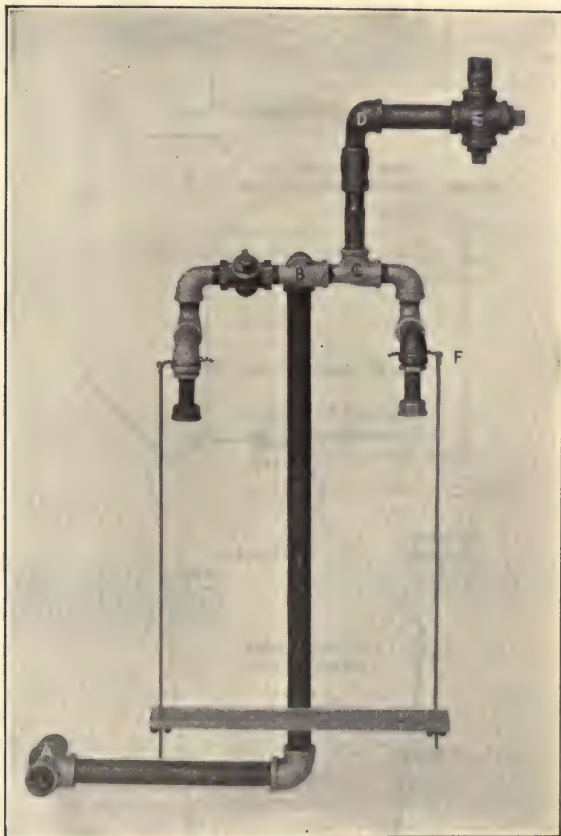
Five-light Connection Joining Inlet and Outlet Piping—Meter Support from Connection, page 467: A, $1\frac{1}{2}'' \times \frac{1}{4}'' \times 1''$ Tee on Service End; B, $\frac{1}{4}''$ Service Tee; C, $\frac{1}{4}''$ Special Service Tee with Solid Male End; D, $\frac{1}{4}'' \times 1''$ Service Ell; E, Bottom of House Riser; F, Wire Hanger Eye.
